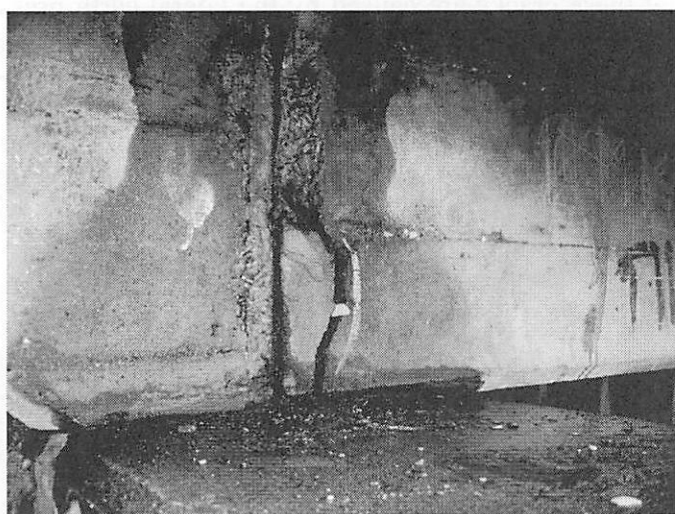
Transverse cracks in column cause by excessive earth pressure
